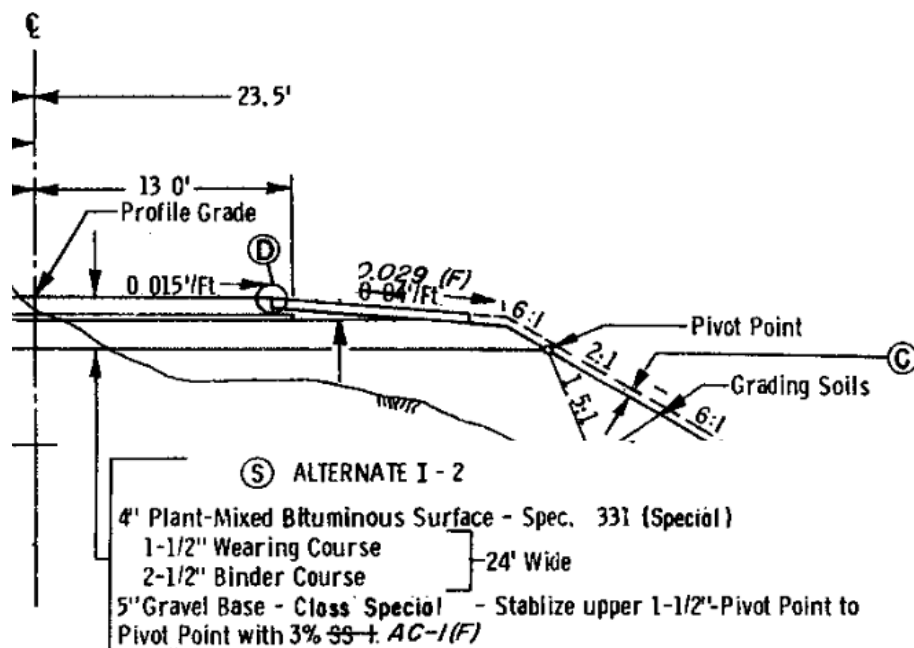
TH 61 mainline typical section (1967 construction plan)
